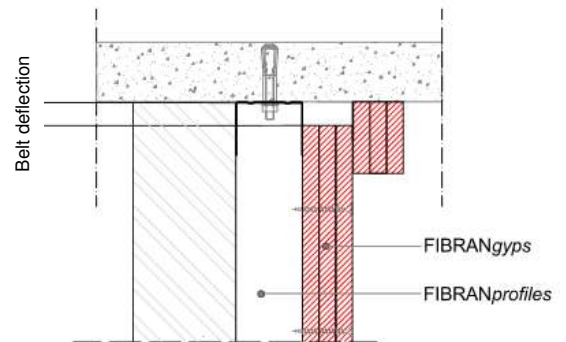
FITTING WITH FIRE RESISTANT WALL
